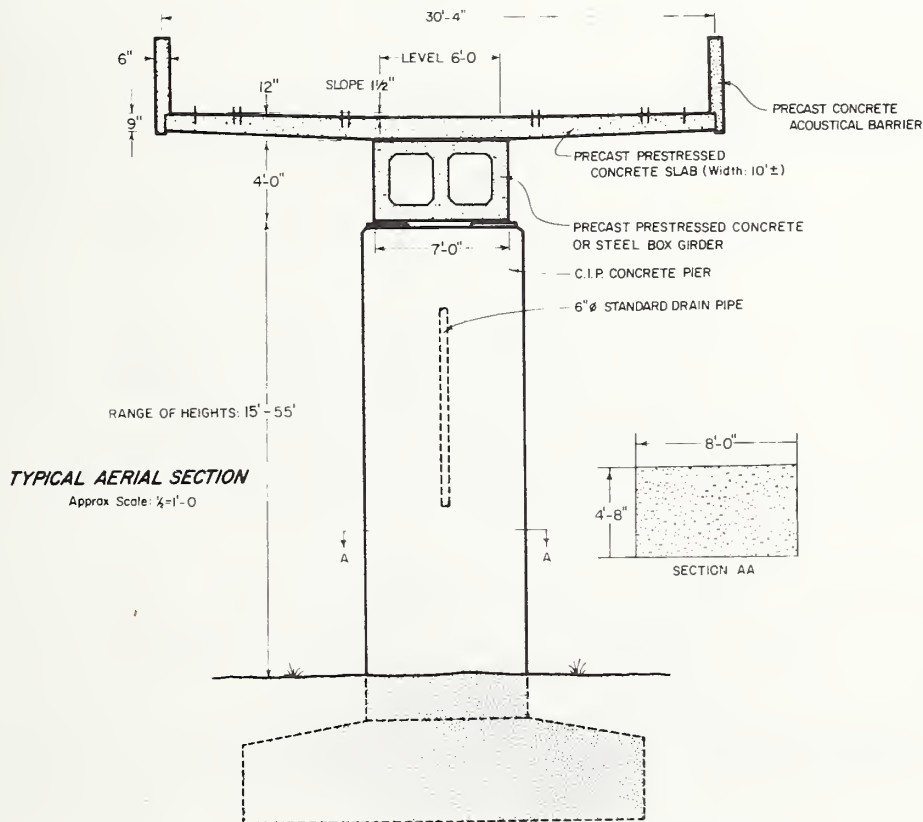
TYPICAL AERIAL SECTION [10-6]
